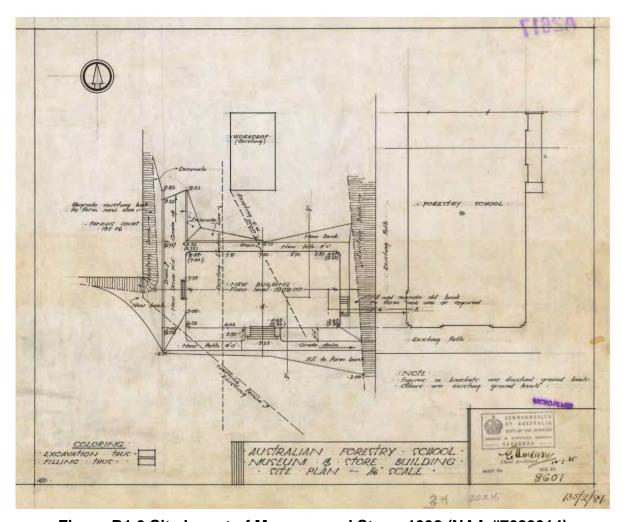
Site layout of Museum and Store, 1938 (NAA #7689914)
